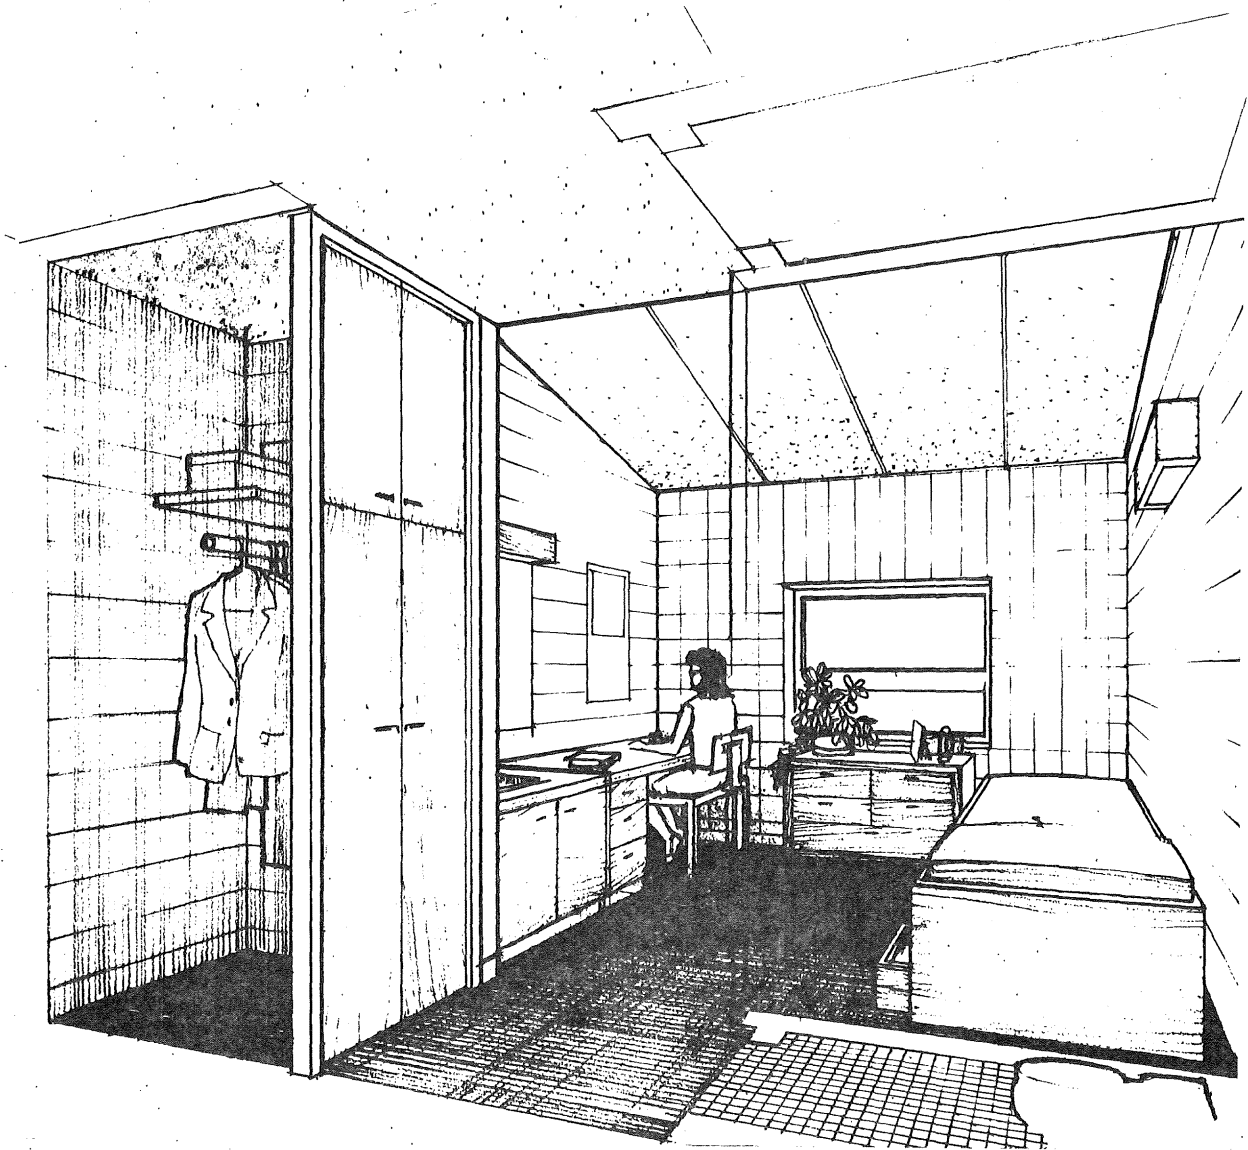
Illustration D is a rendering of a typical resident room in one of the three 24-room minimum/medium security buildings. This illustration shows the room from the hallway with the front wall cut away. The room's toilet would be located immediately to the right of the entrance to the room and the sink is built into the vanity.
